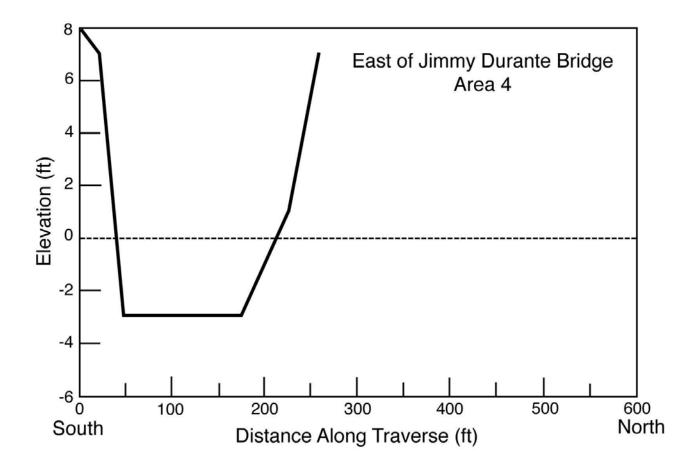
Proposed inlet channel cross-sections east of Jimmy Durante Bridge.
